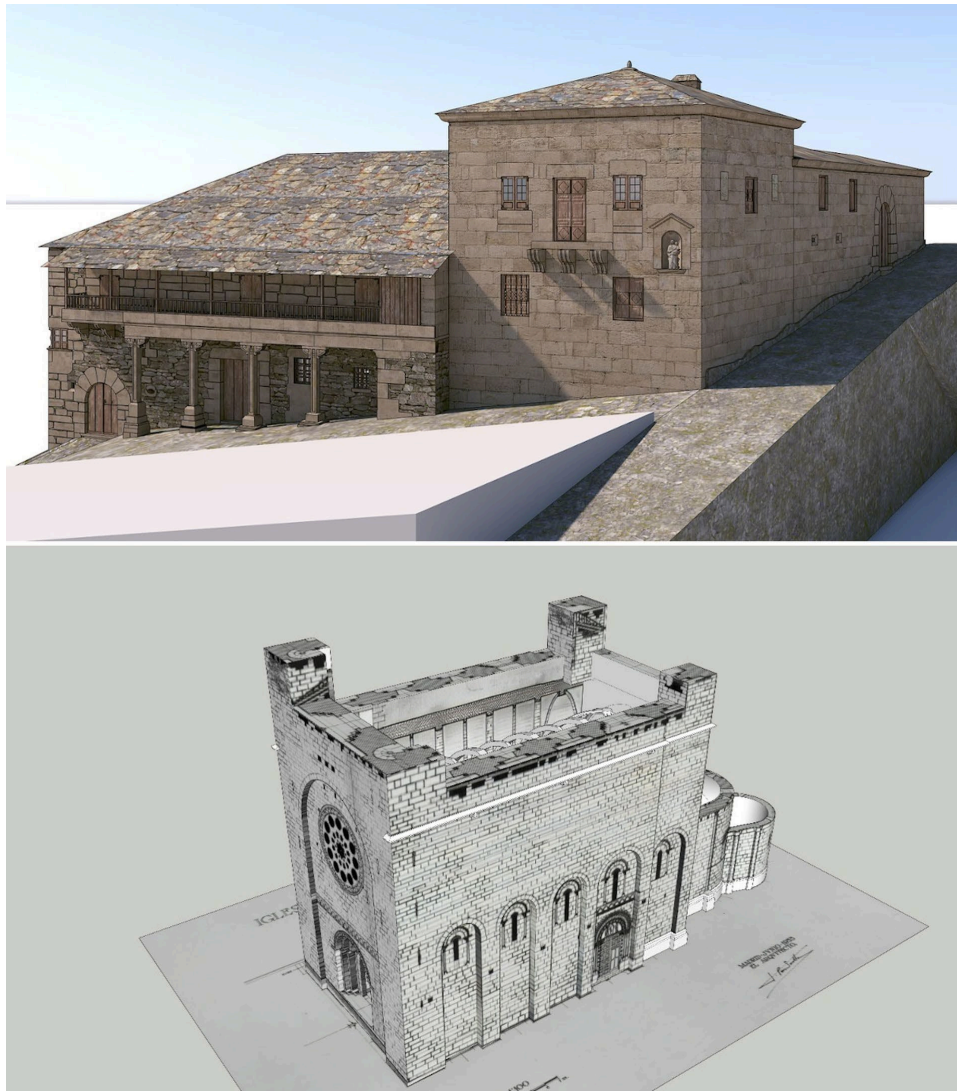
Modelling of elevations and volumes for the Pazo del General Paredes and the Church of San Nicolás
